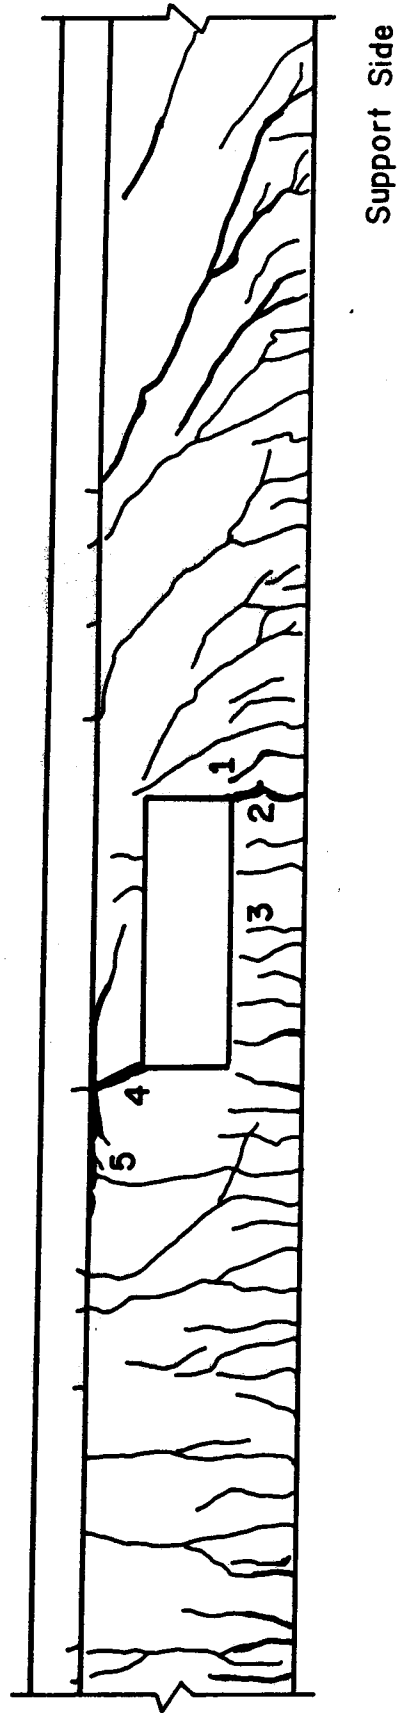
Crack Pattern - BEAM C3.
